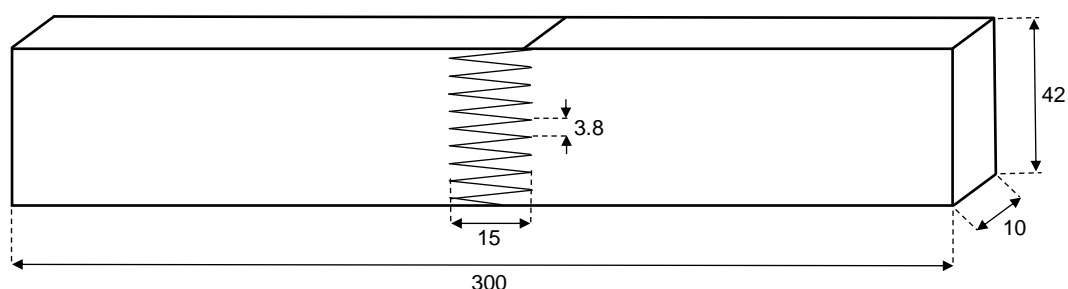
Finger-jointed specimen (dimensions in mm)
